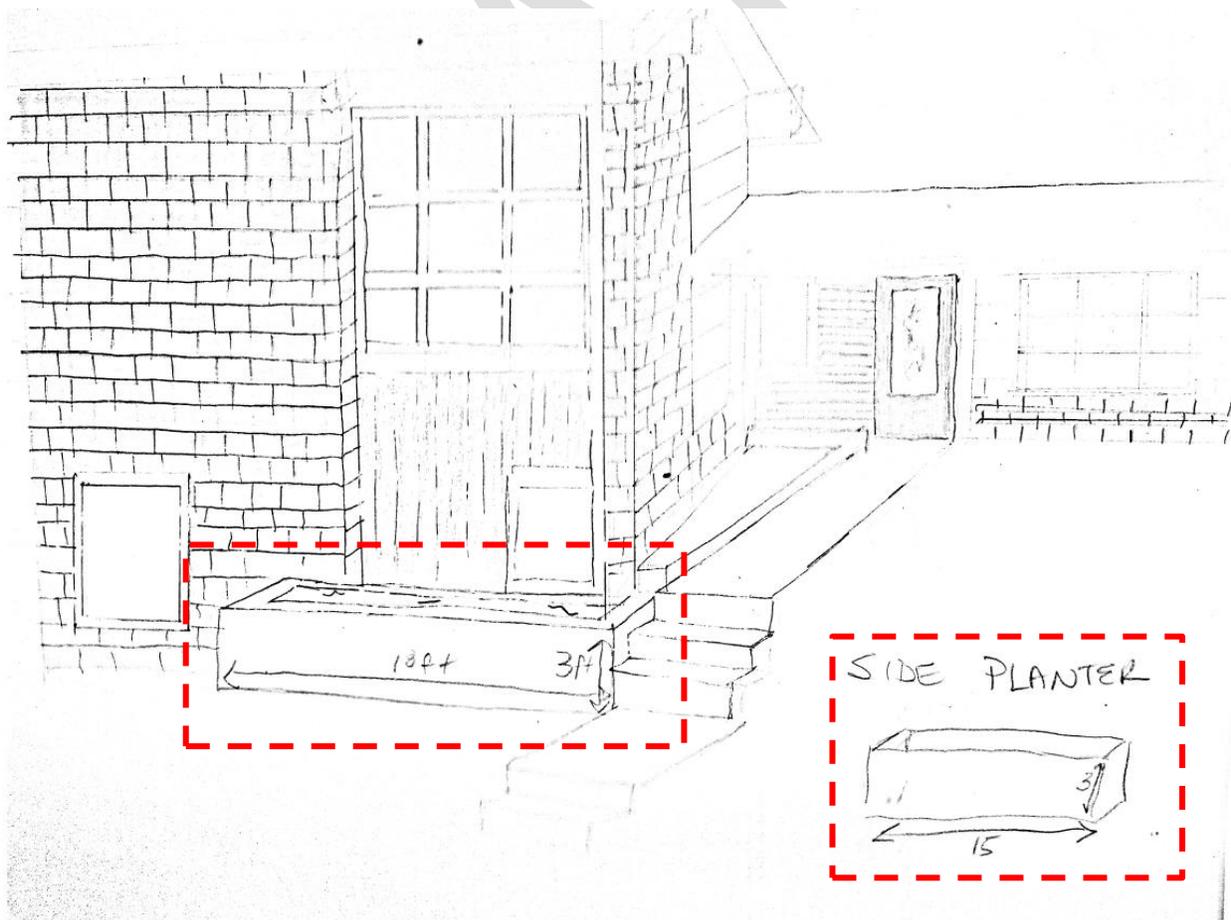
DETAIL OF WEST (FRONT) PLANTERS PRIOR TO REMOVAL
